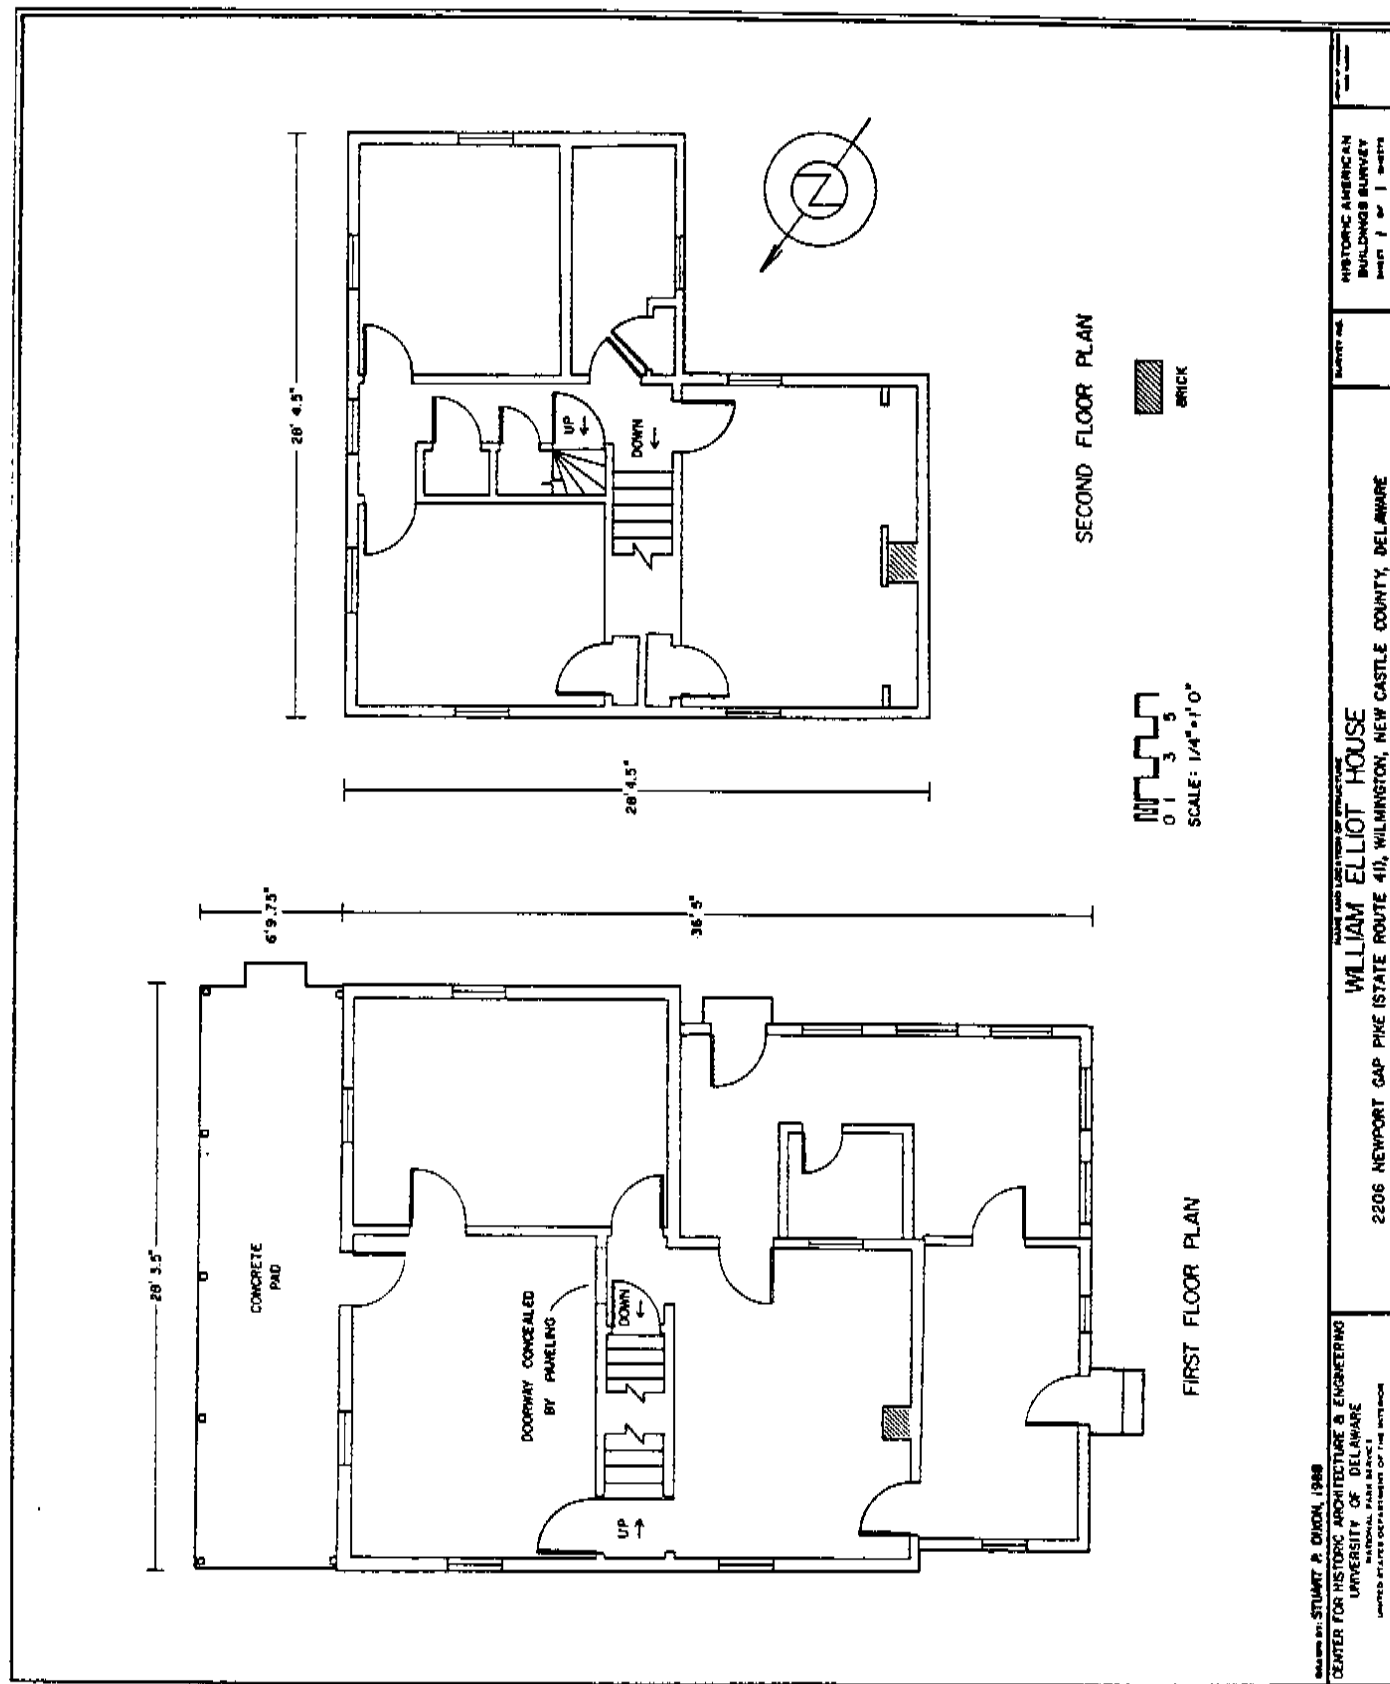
Floor Plan of the William Elliot House (Drawn by Stuart Dixon)
